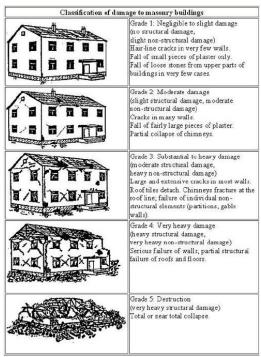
EMS-98 damage scale for masonry buildings [198]
